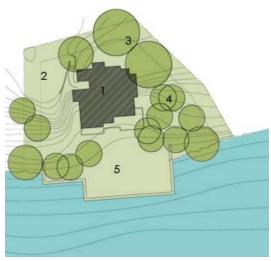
Site Plan - 1. House 2. Parking 3. Garden 4. Garden 5. Front Lawn
